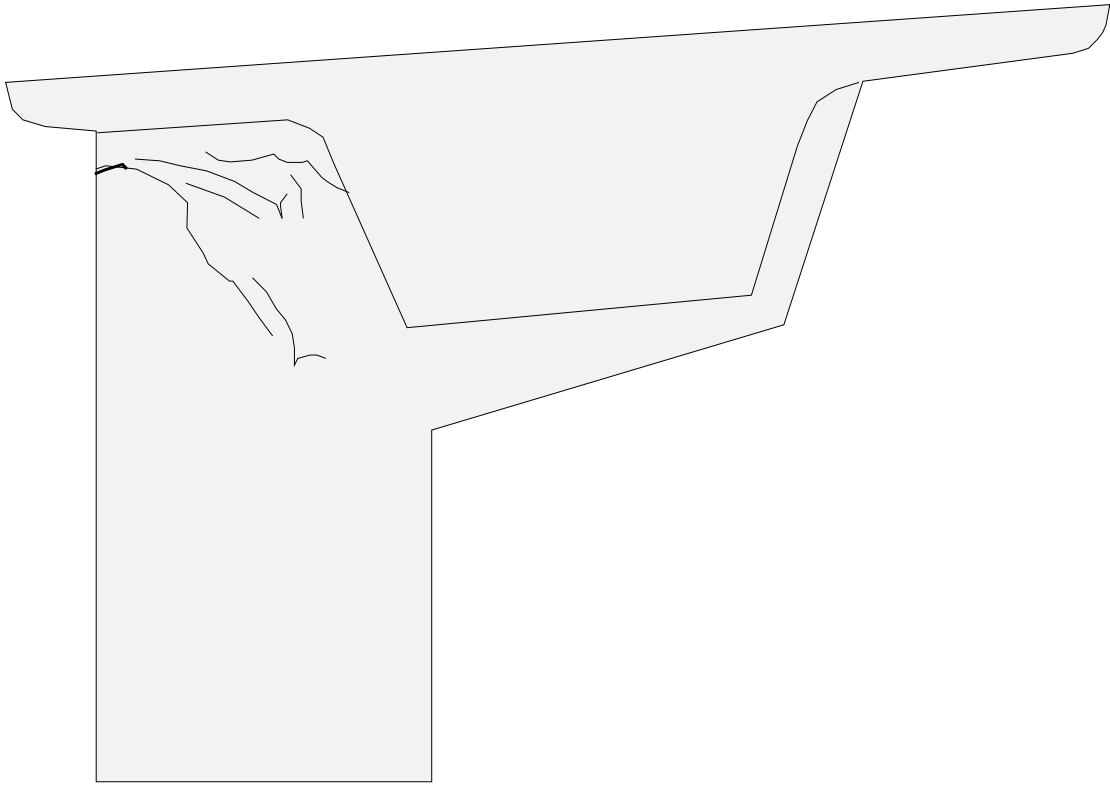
Pattern of Cracks in Pier I-2C
